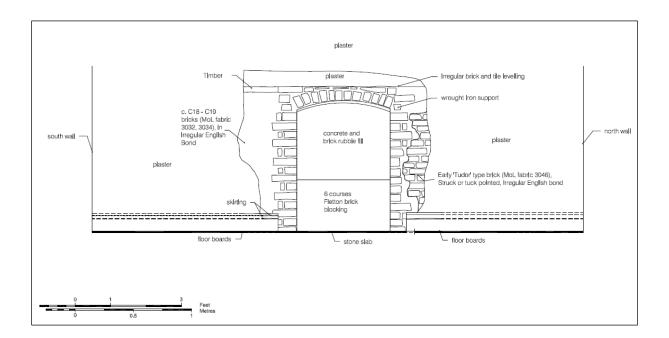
Room 231, west internal elevation, early brickwork and blocked fireplace revealed
